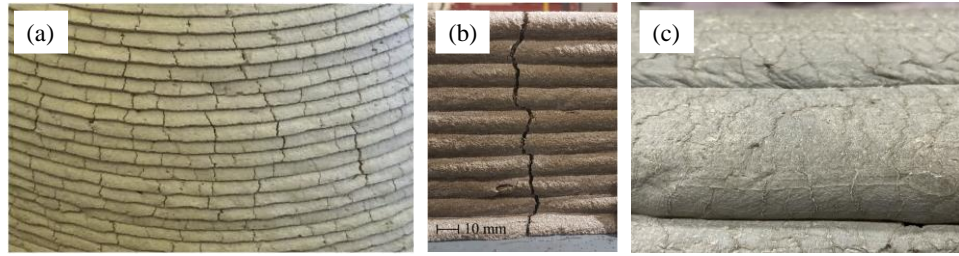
(a) Excessive cracks [113], (b) penetrating crack [114], and (c) surface cracks in 3D printed concrete/mortar elements.
